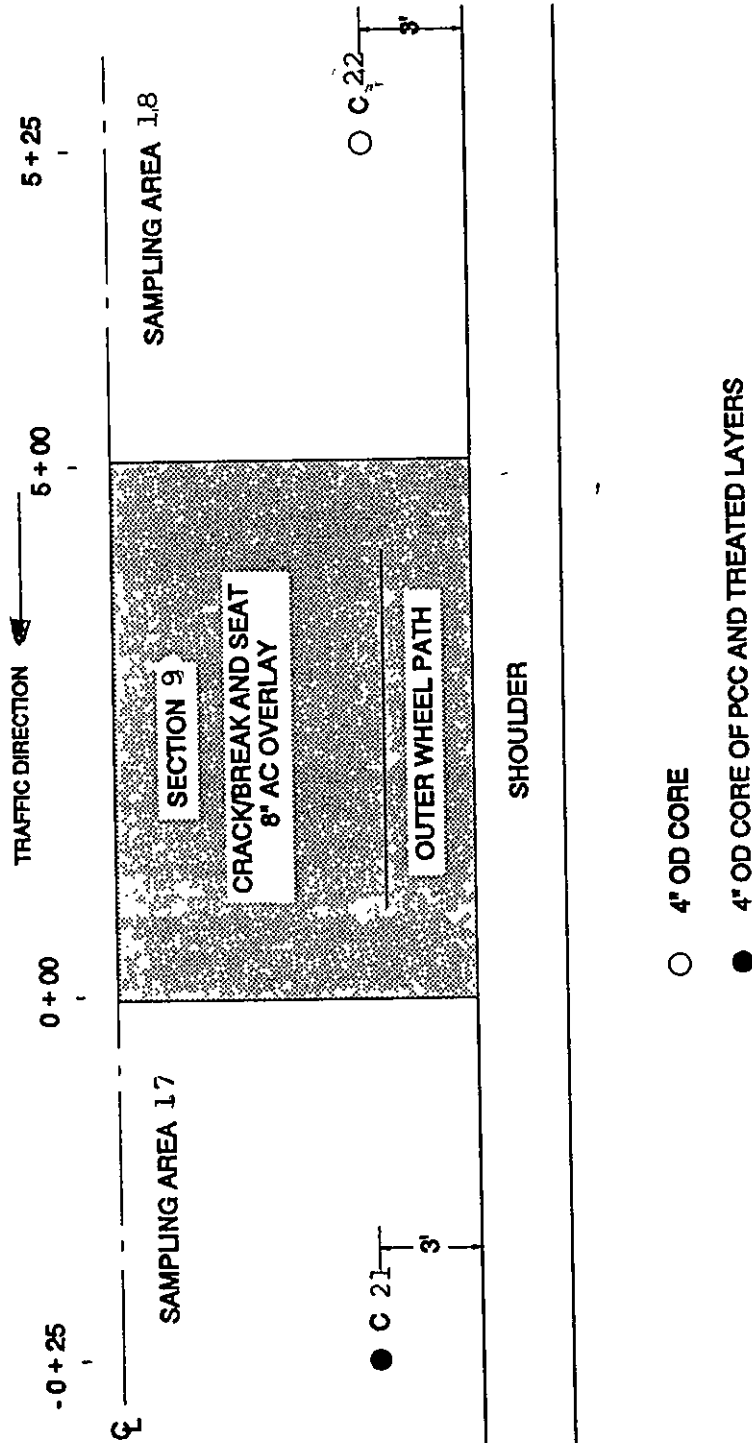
Example of "Pre-Construction" Sampling Plan for Test Section 9
